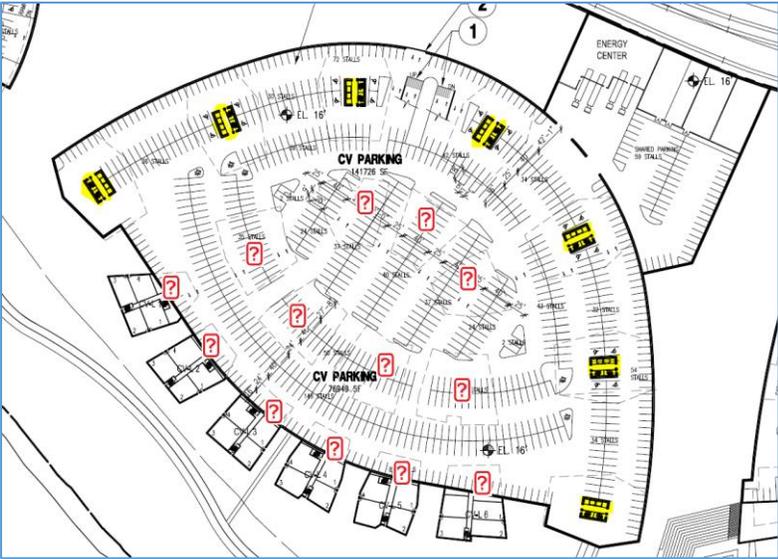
Central Village Parking Plan with Elevators and Stairs Highlighted and Approximate Location of Missing Access Points (Adapted from Sheet A-054 [2017])
